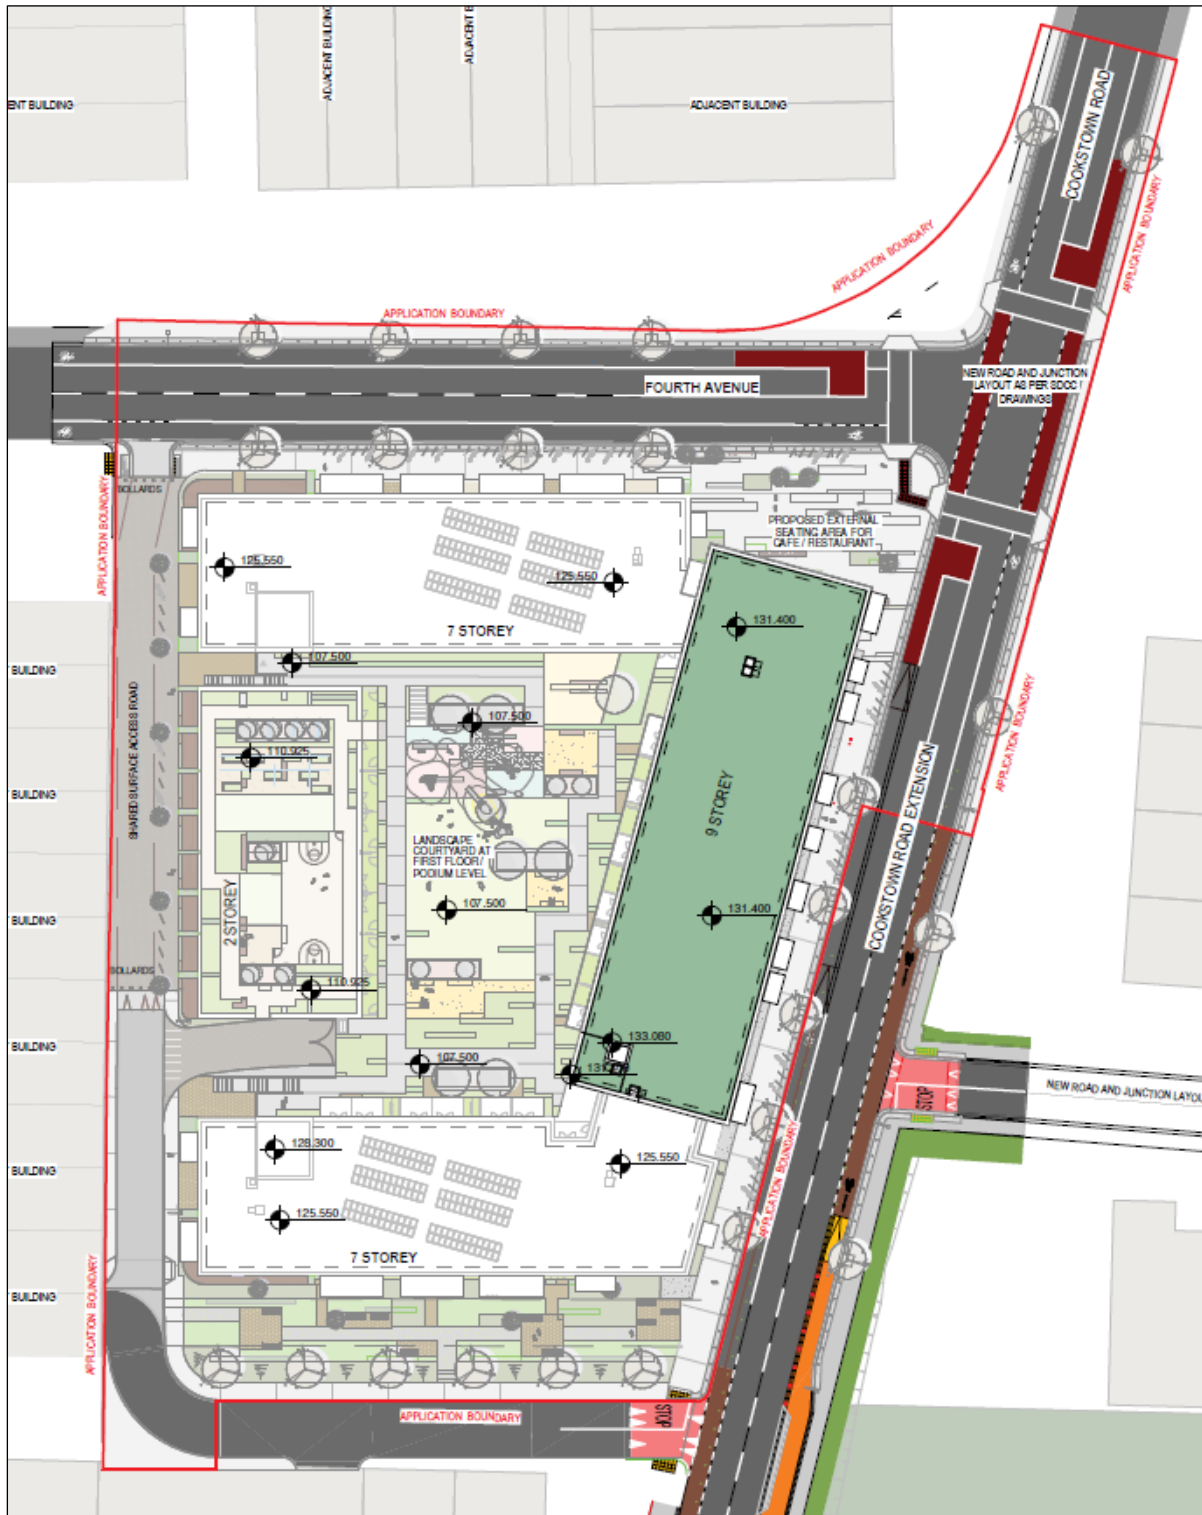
Site layout plan of proposed development under ABP Ref. ABP-308398-20
